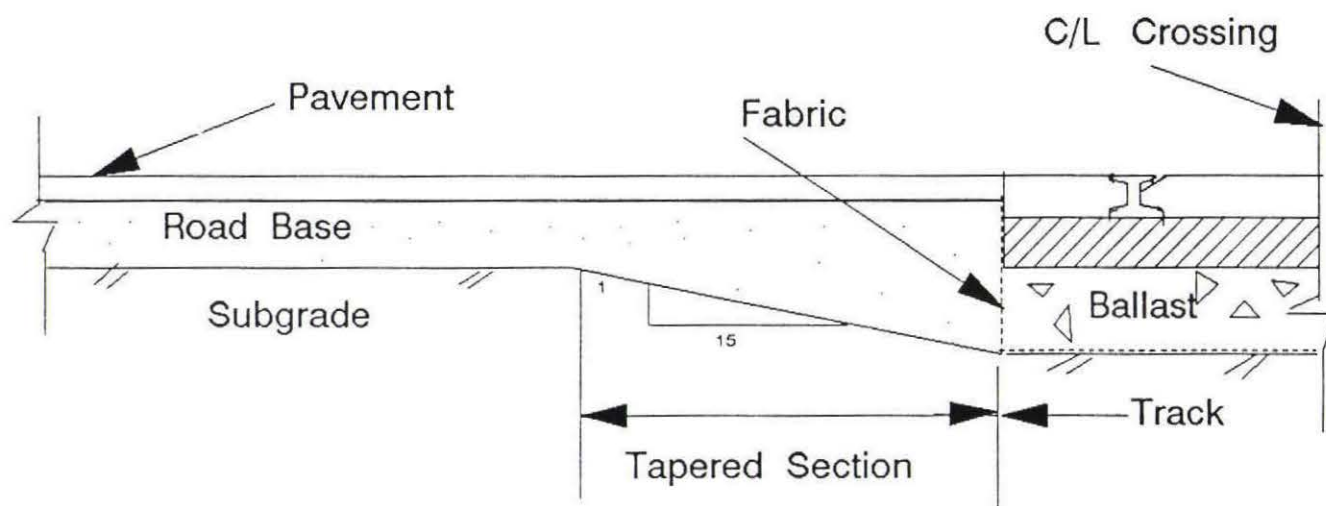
Proposed Excavation Profile At Perpendicular to the track
